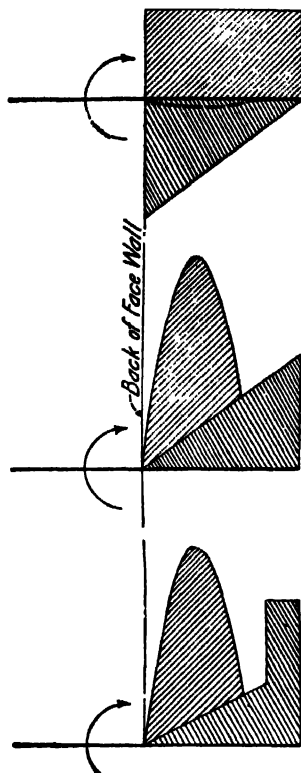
Loads on Base Slab of Counterforted Retaining Wall.
